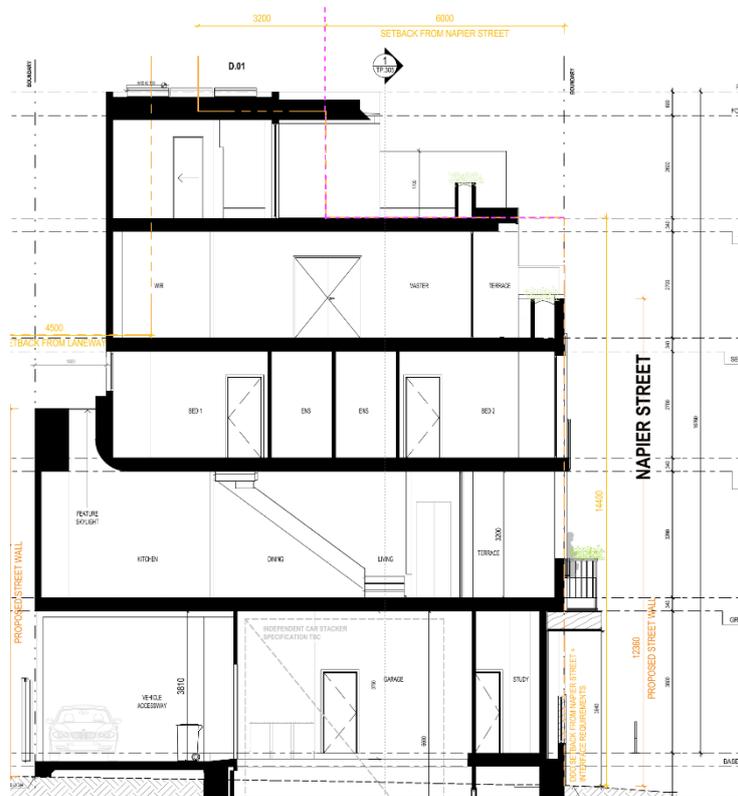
Section A-A from decision plans with 6m setback above maximum street wall added in pink to demonstrate indicative extent of non-compliant built form of upper level.
